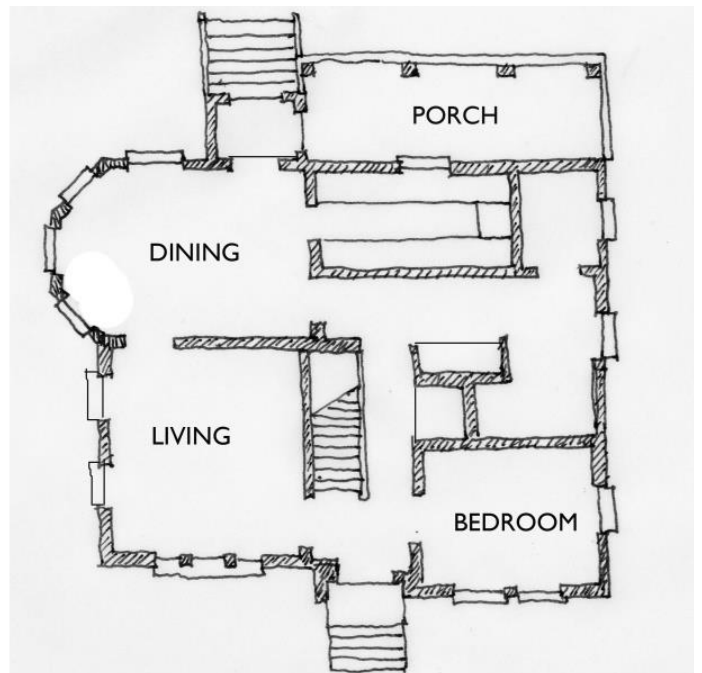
Sketch of the existing main floor of the Wixalbrown House
